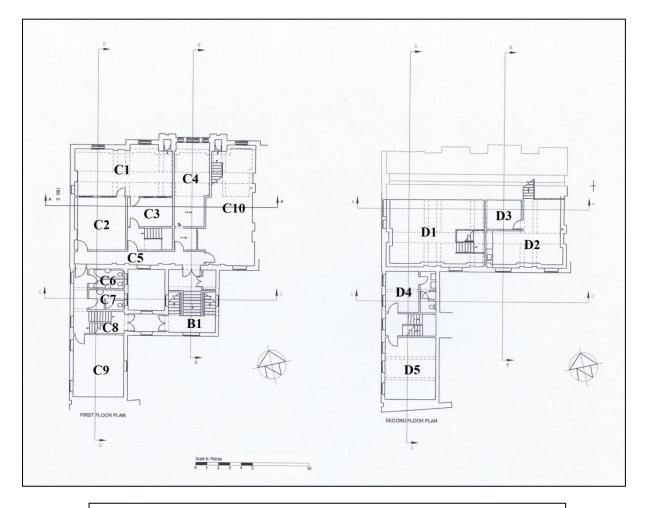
Shoreham Town Hall: First and Second Floor Plans Adapted from architects drawing
